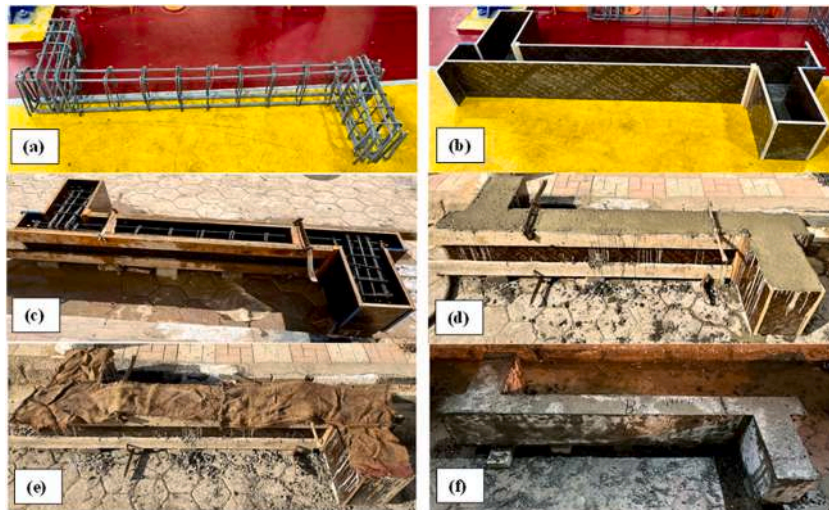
Stages of preparing specimens (a) reinforcement of specimen, (b) formwork of specimen, (c) reinforcement in formwork, (d) casting specimen, (e) curing specimen by spraying water on the jute bags, (f) final specimen after curing.
